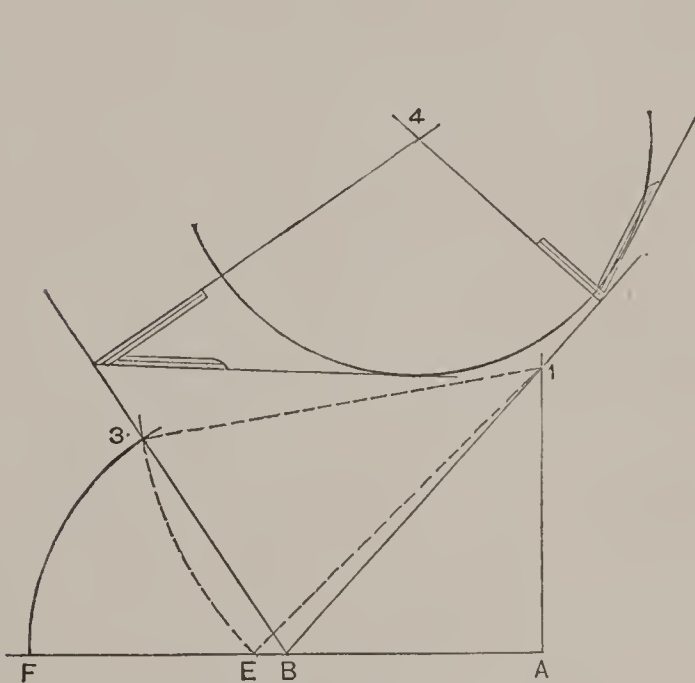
ELEVATION, BEVEL, RAKE AND LEVEL TANGENTS, TO COVER GROUND PLAN OF FIG. 155.
